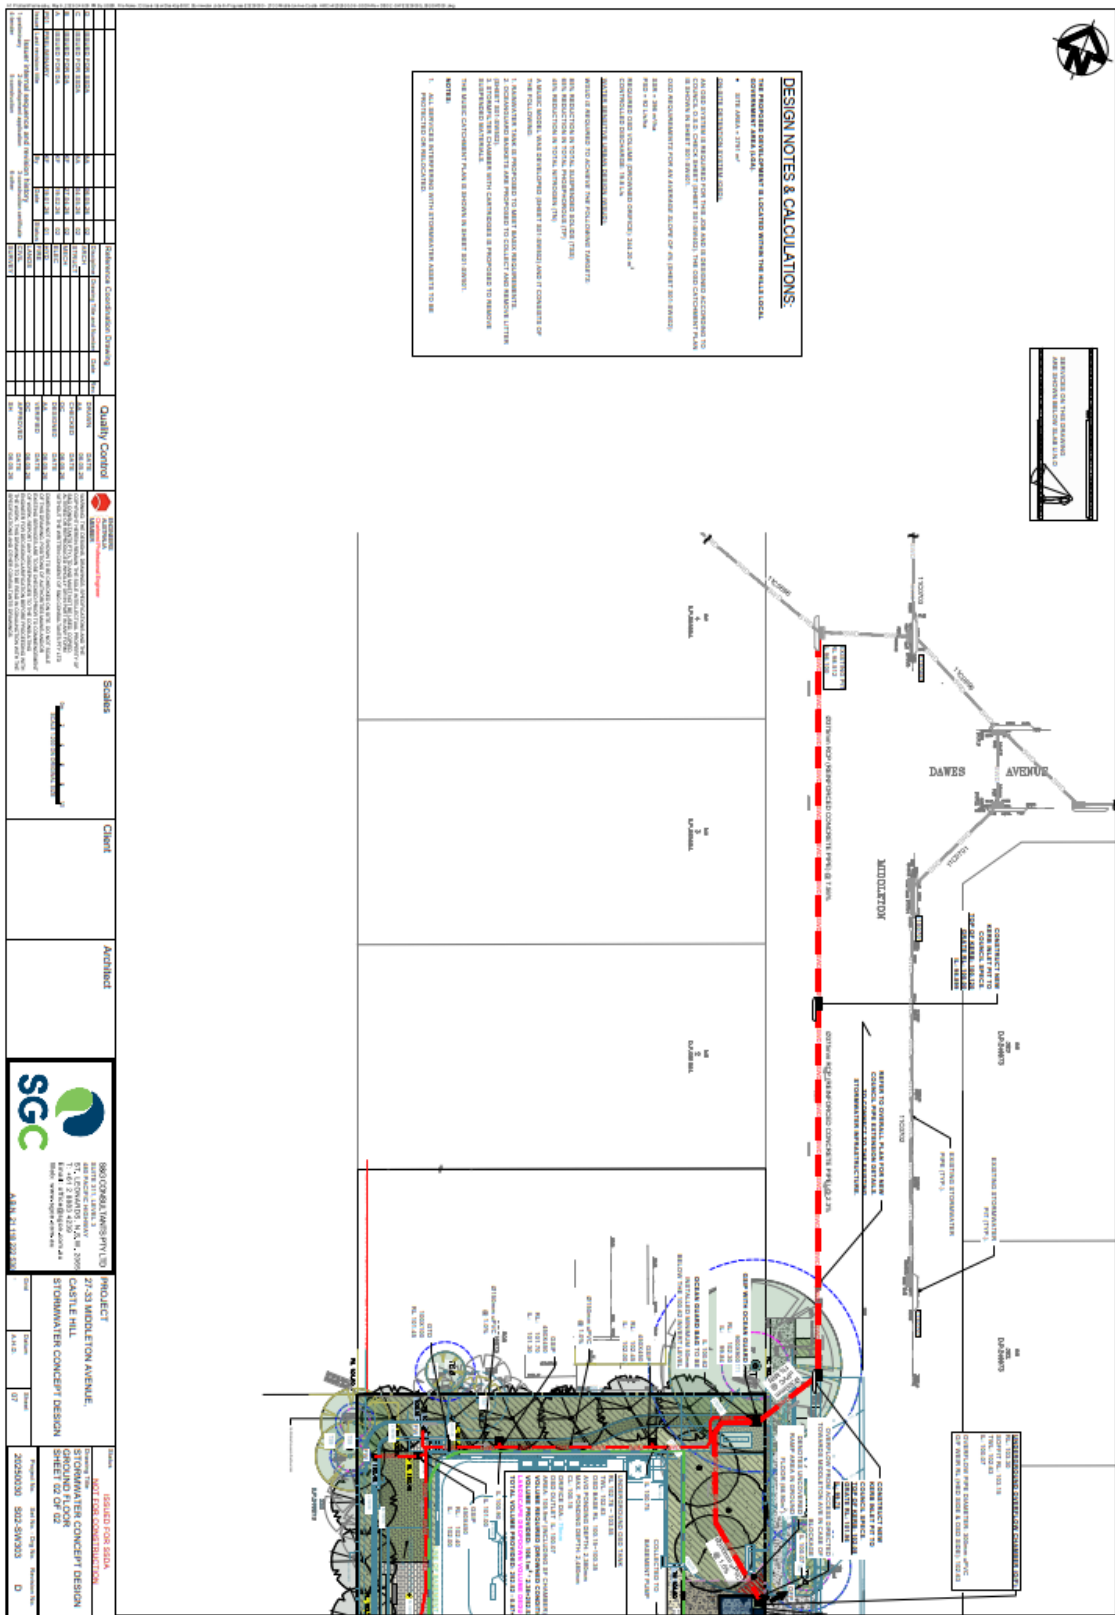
Ground Floor Stormwater Plan (S02-SW302)
